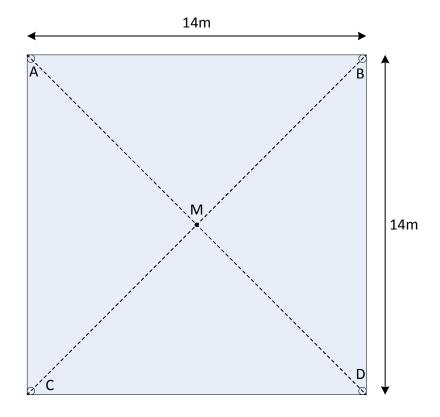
Roof example with four 75mm roof outlets at the corners
